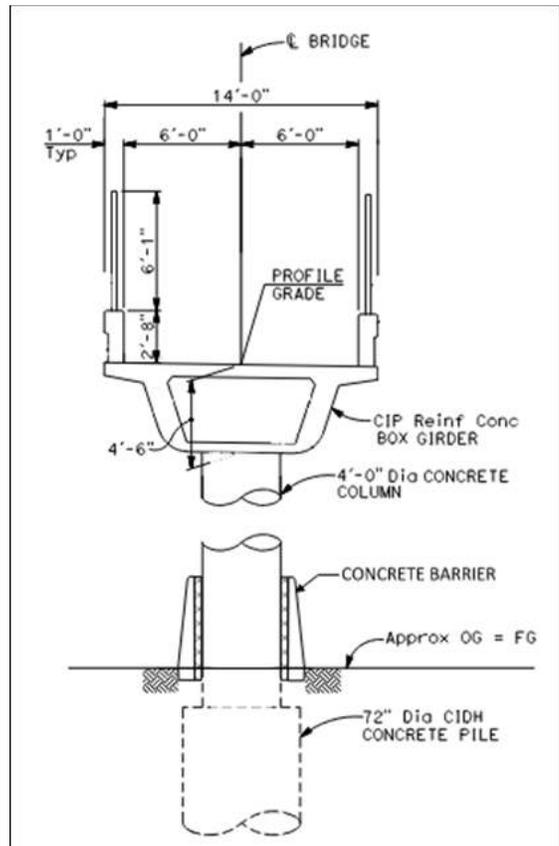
Two-Span Option Typical Section - CIP/PS Concrete Box Girder Superstructure
